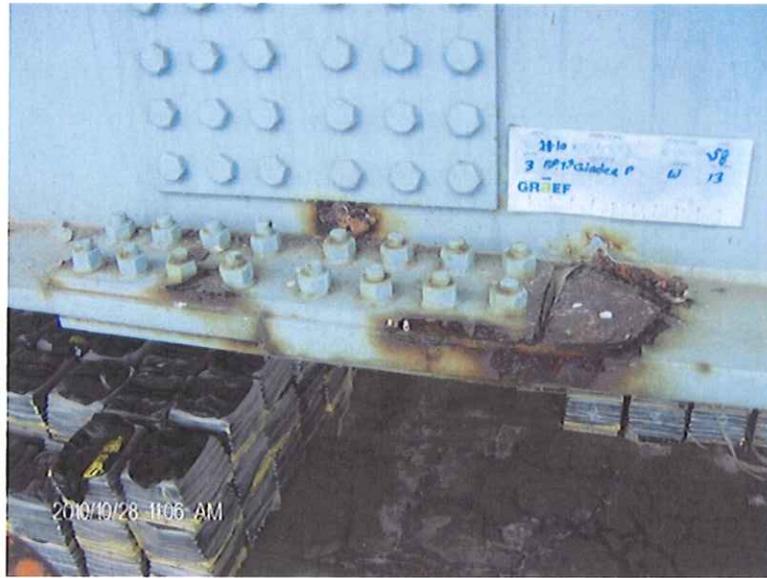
Multigirder fascia - laminate rust at bottom flange splice plates
